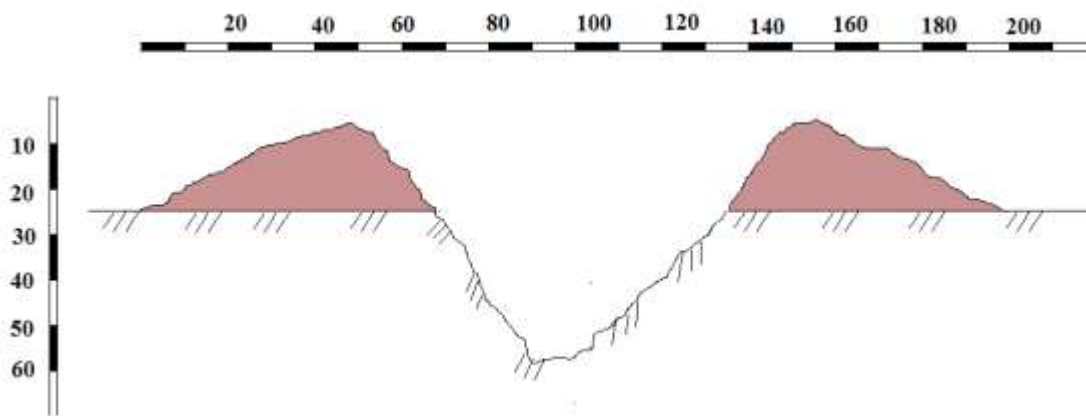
Cross-section of the sprinkler cut by the existing KBN-0,35A furrow ditch digger
